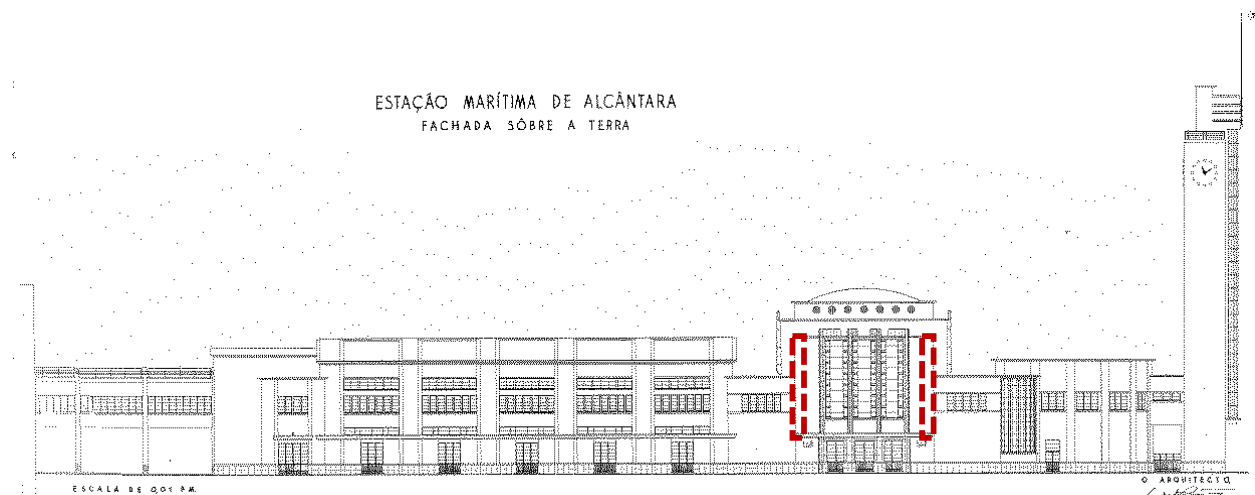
Cross section of Alcântara station with marked positions of murals inside of the building. Source of section: [6]
